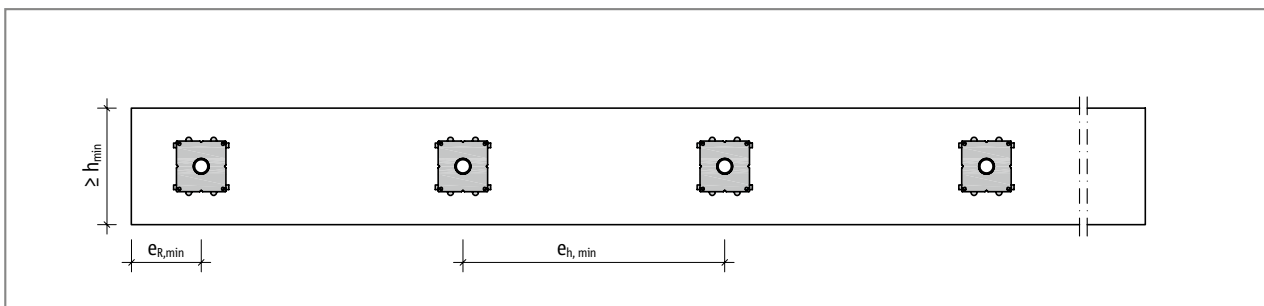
Schöck Dorn type SLD-Q: Minimum structural component dimensions and dowel spacings in a slab
